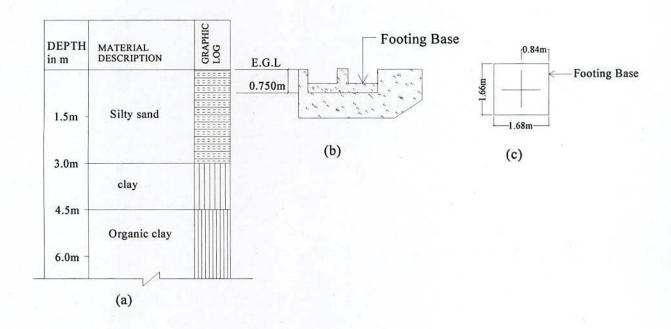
Footing placed on natural ground: (a) Sub-soil profile, (b) Section of footing and (c) Plan of footing
